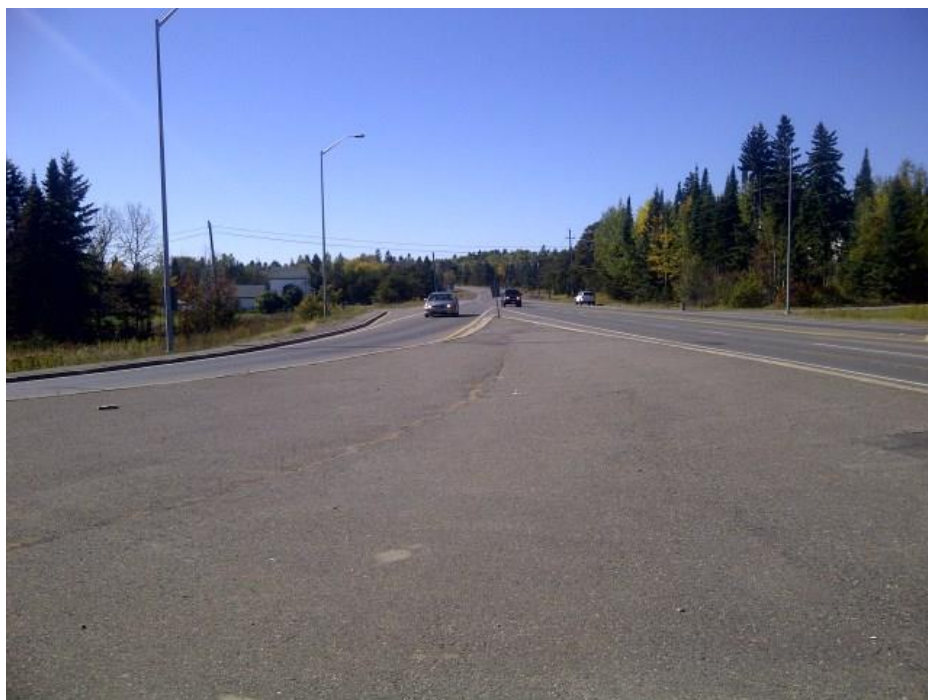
Looking west along John Street from Highway 11/17 Intersection
